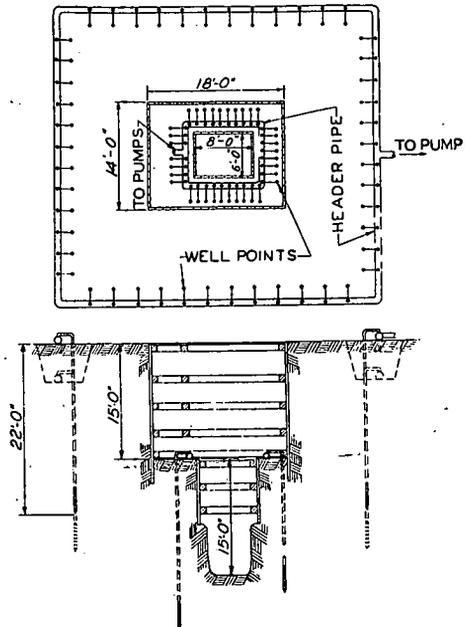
FRANKLIN FALLS. DRY PIT, FOR FOUNDATION EXPLORATION.
